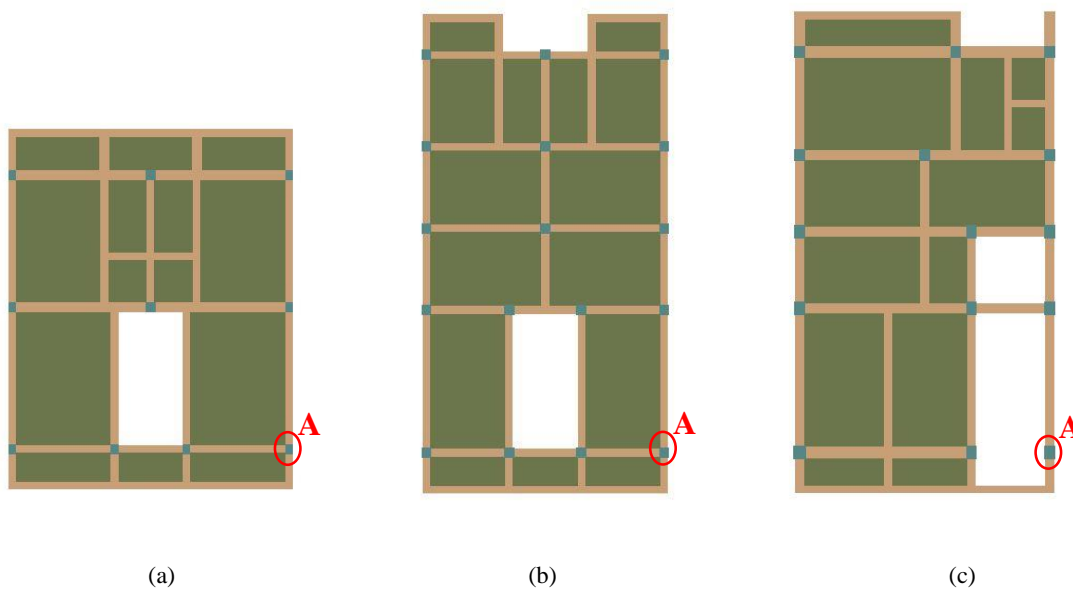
Structural plan view (a) five, (b) six, and (c) eight story building (not to scale)
